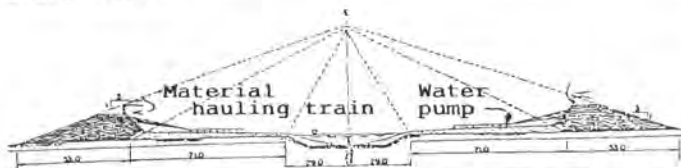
Schematic Illustration for Semi-hydraulic Fill Construction
